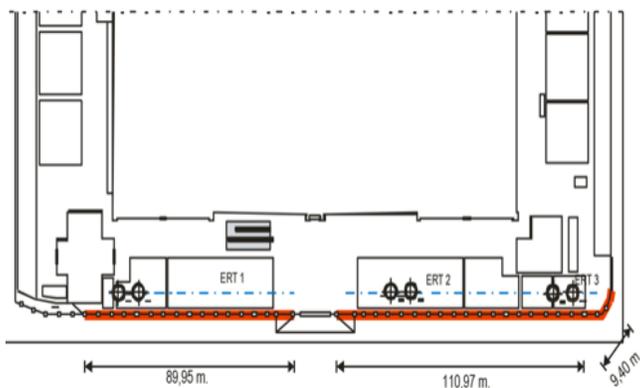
The intervention was carried out from inside the building without affecting the main access. Three monitoring stations, dynamic penetration tests and multilevel injections were used under constant instrumental control. ©GEOSEC.ES
